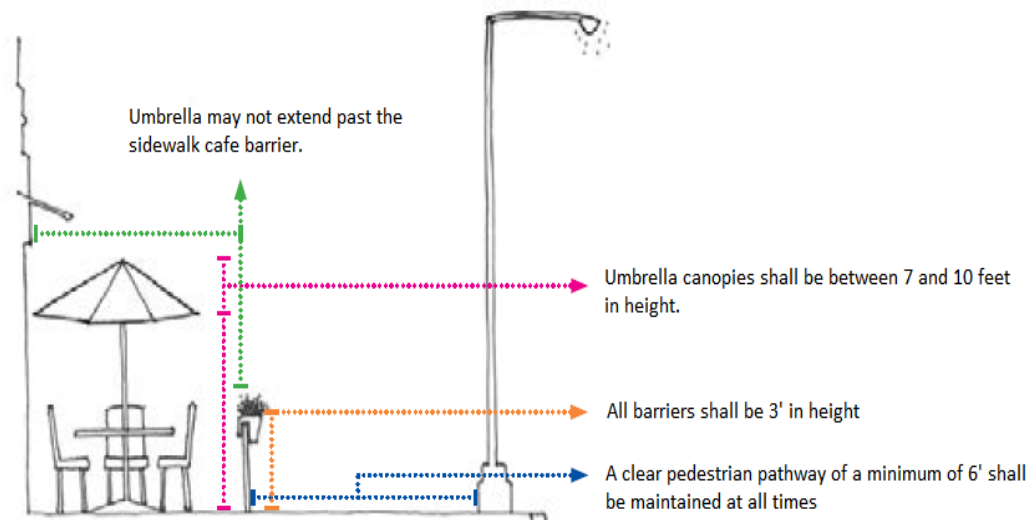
1 Sidewalk Cafe Cross section diagram
